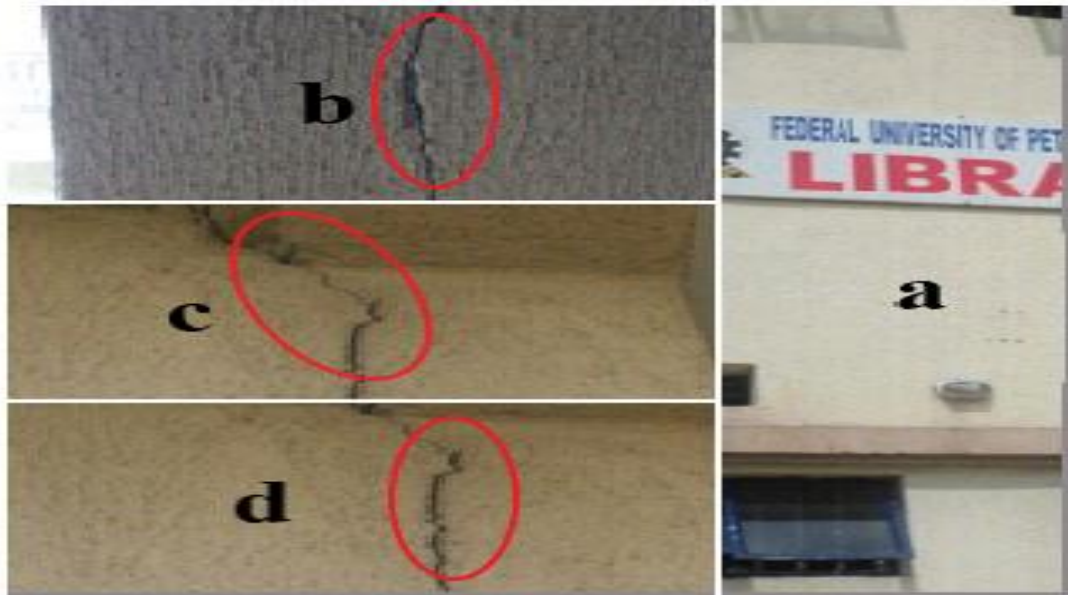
Library Building, showing the severity of some vertical cracks on parts of the building (a) part of the building under study (b) vertical cracks upstairs (c) and (d) vertical cracks downstairs.
